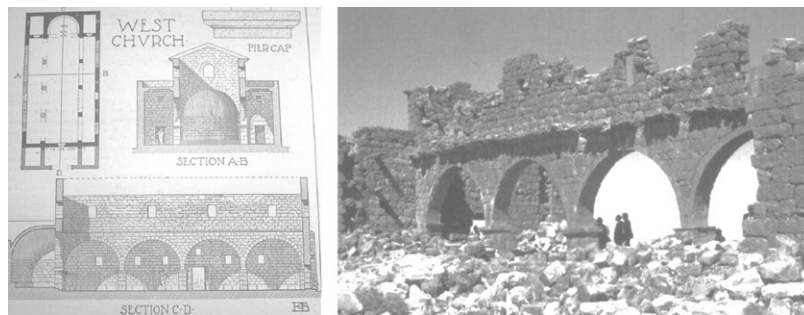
Plan and section of West Church, (Butler, 1929, p. 115), a view facing south-east, (Kennedy, 2016, p. 20
